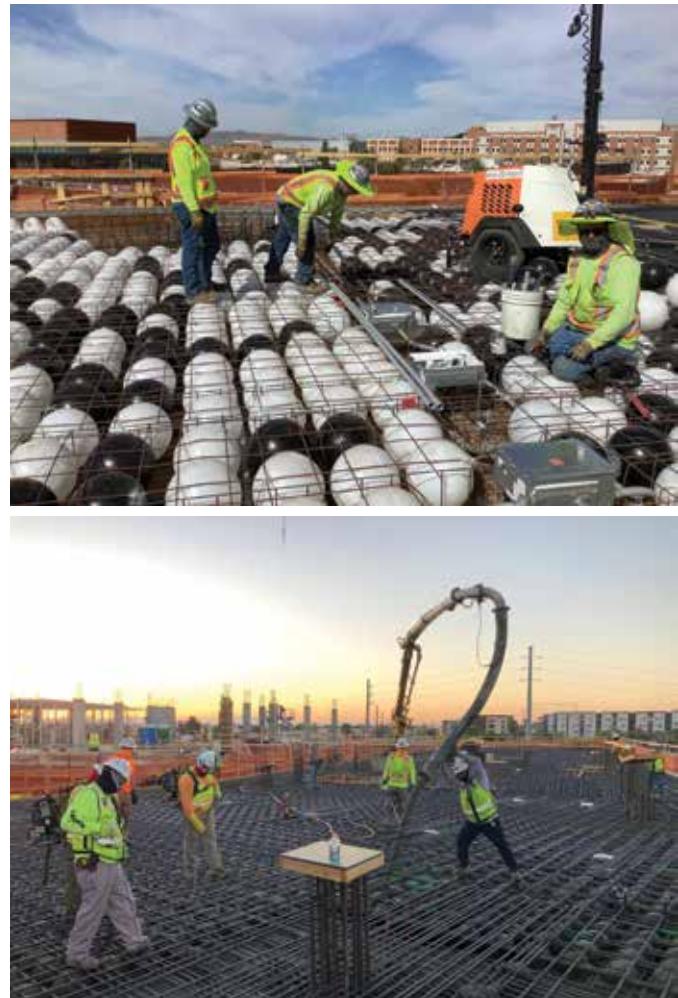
The voided form installation and concrete placement for the elevated deck (courtesy of McCarthy Building Companies)
